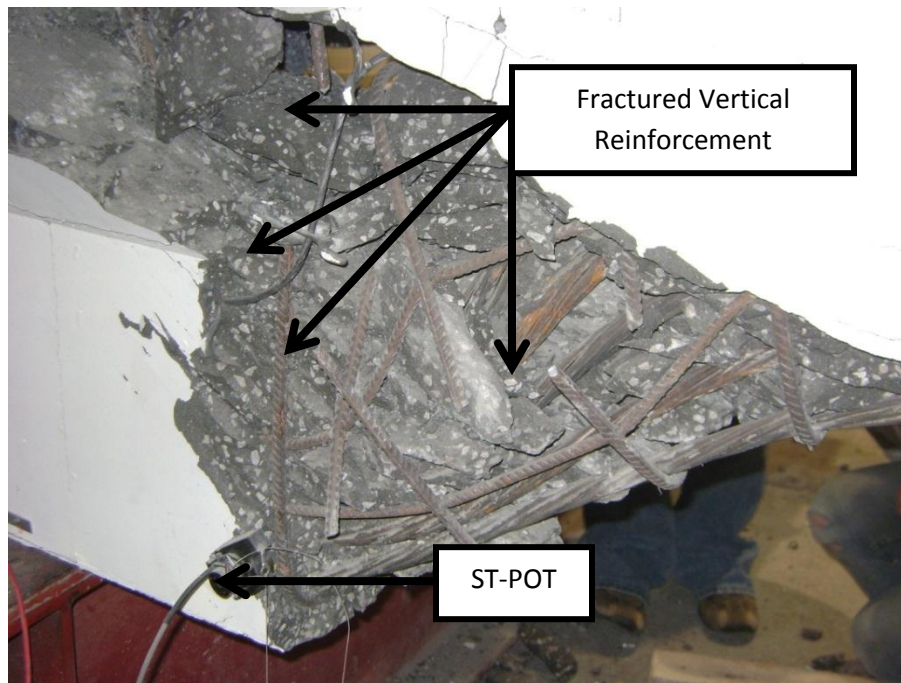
BDT Girder 2, shear failure surface directly under vertical stirrup ST-POT
